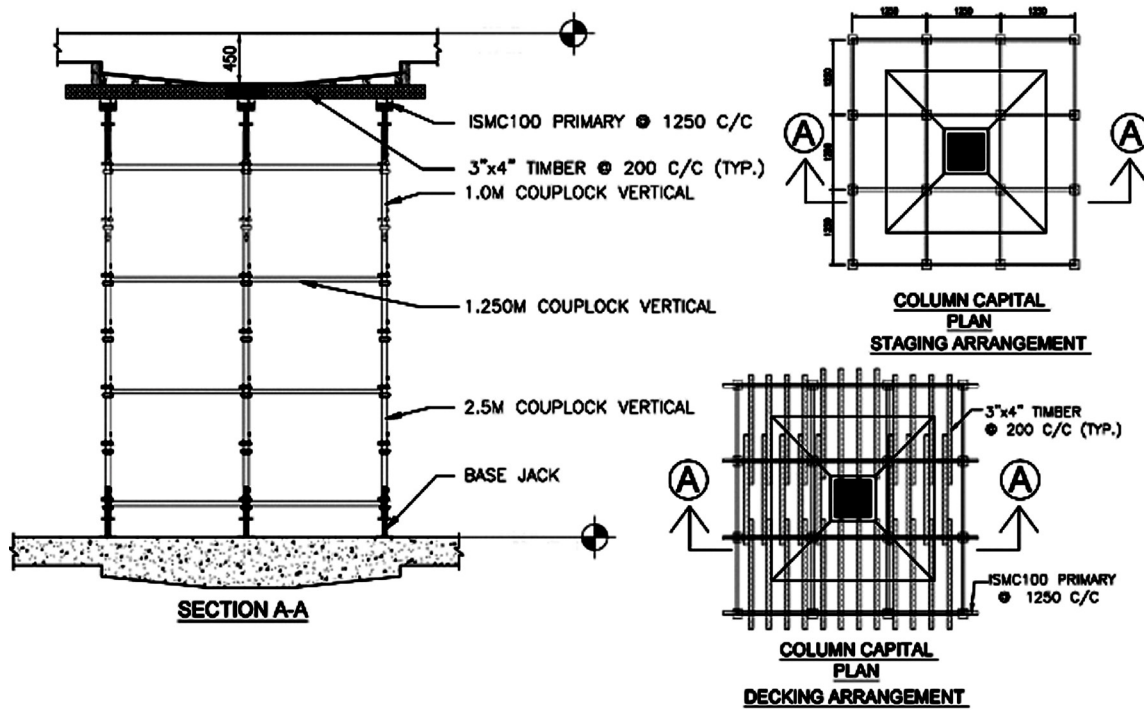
Plan & Section view of column capital with decking and supporting arrangement
